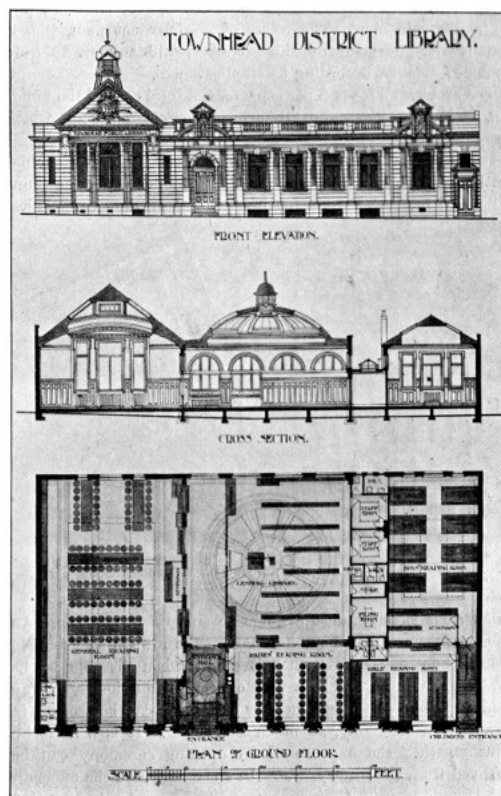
Glasgow Branch Library, Plan and Elevation (Section 122).
